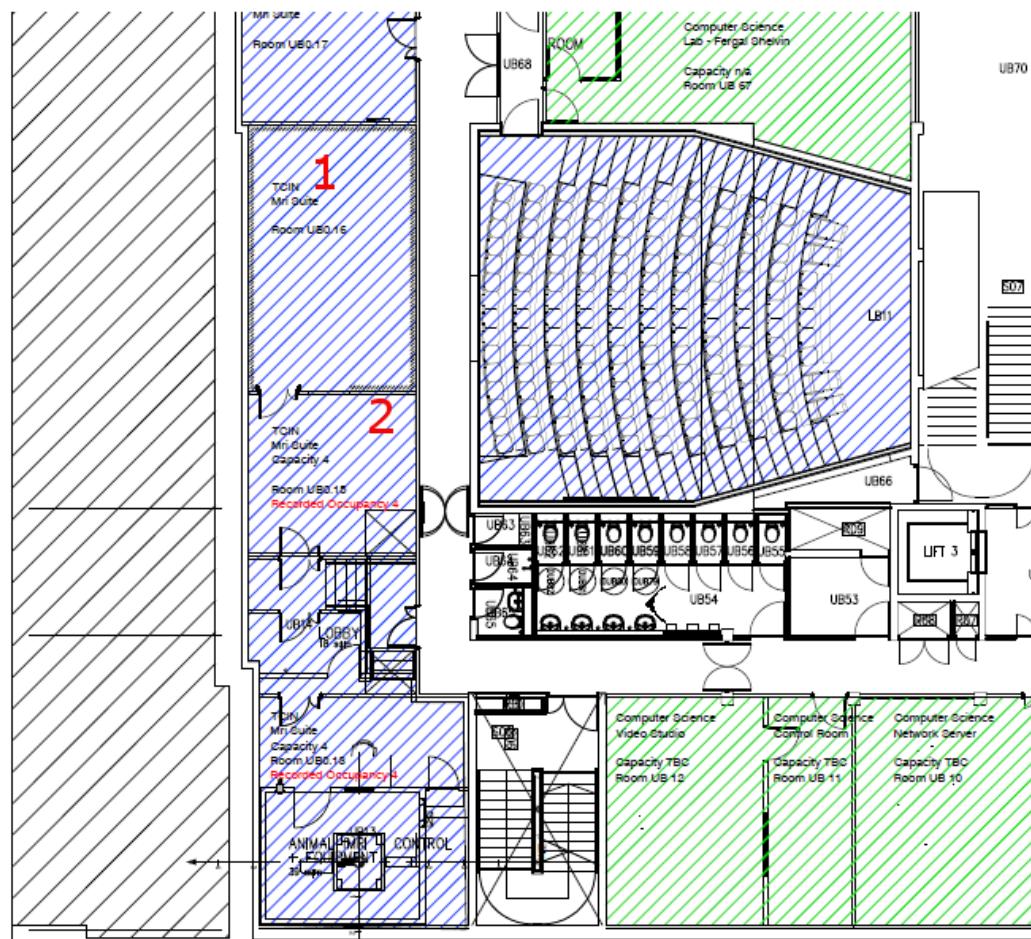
Floor Plan of Human MRI Facility in the Lloyd Building
